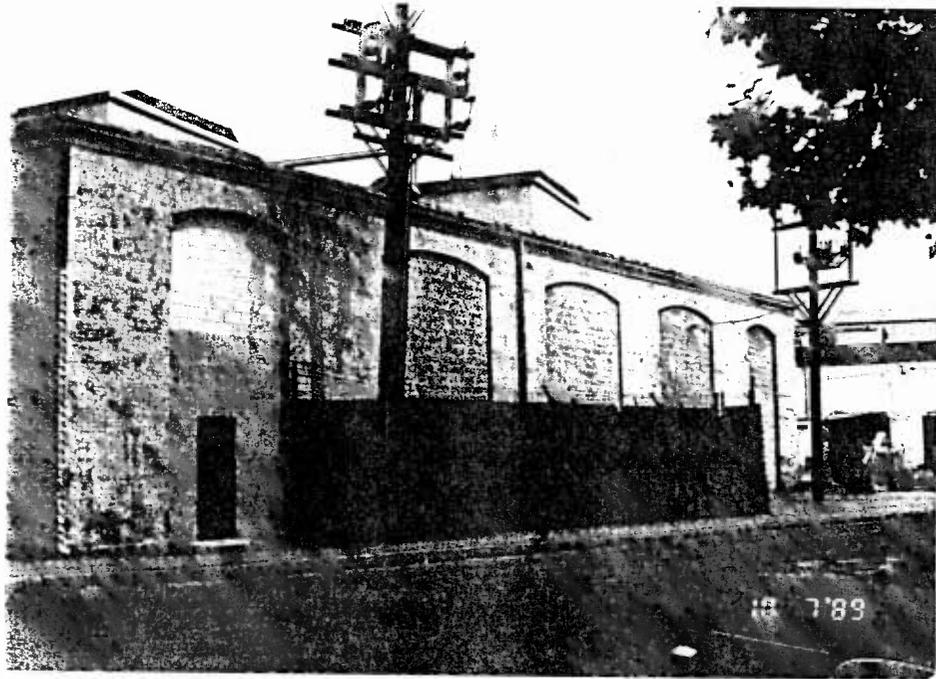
Southwest and southeast elevations of the Pullman Palace Car Building No. 4 (N-3648.05) looking north (Photograph by D. Gula)
